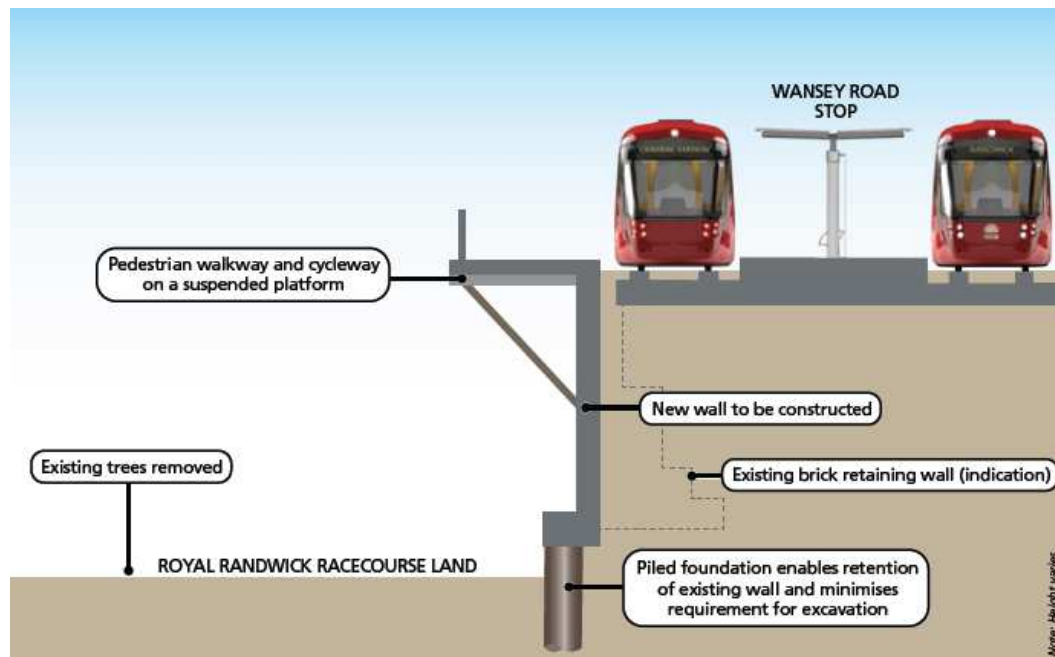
Typical section through Wansey Road Stop (sourced from EIS Figure 10.5).
